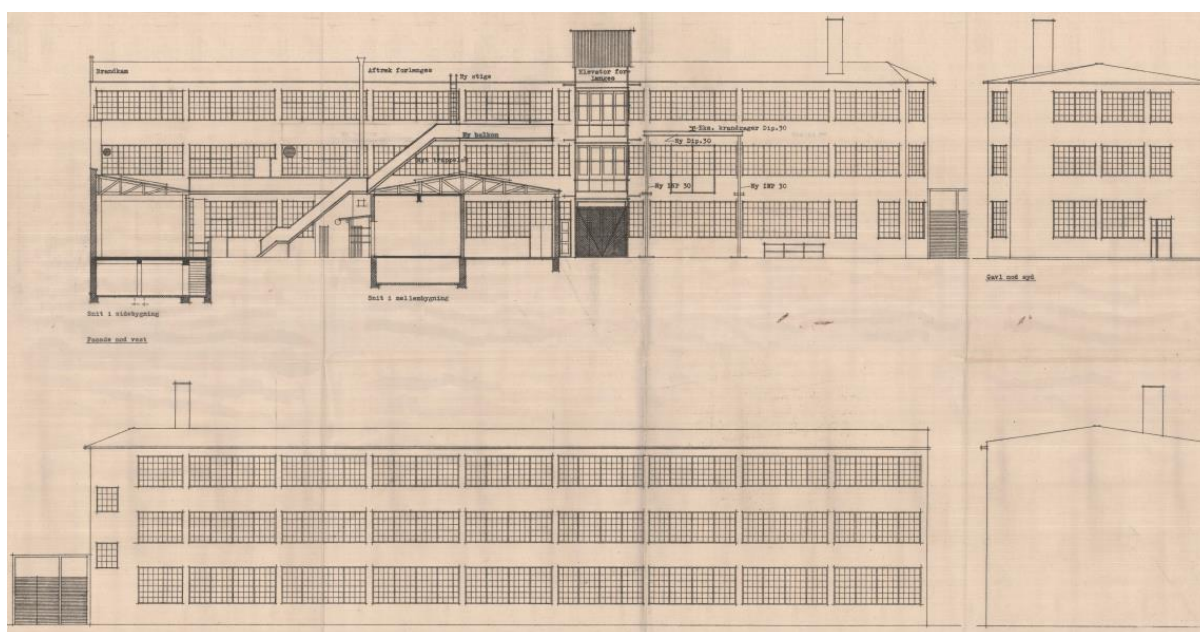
Original building after addition of extra floor to the factory building in 1952.
